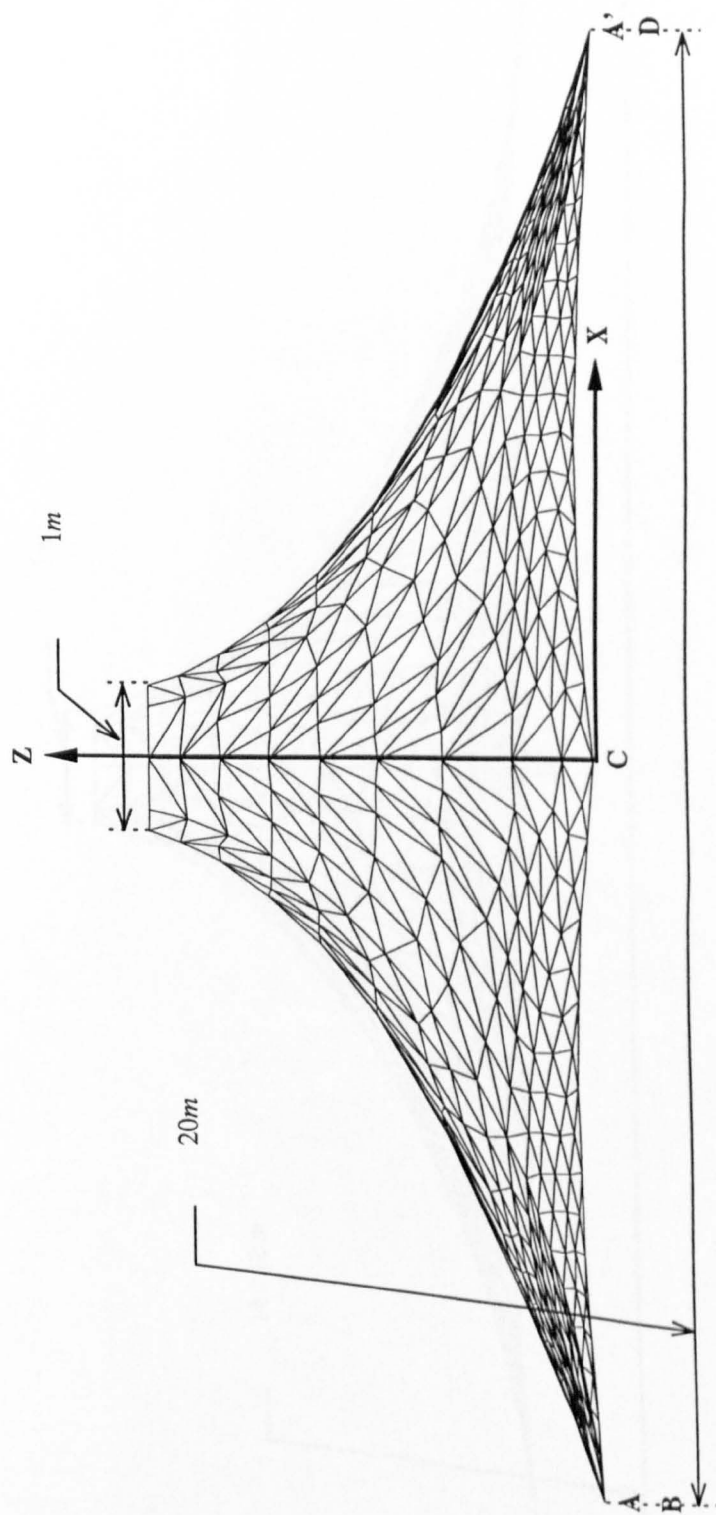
Example 5.2.6 - Side Elevation (Cross-Section AA').
